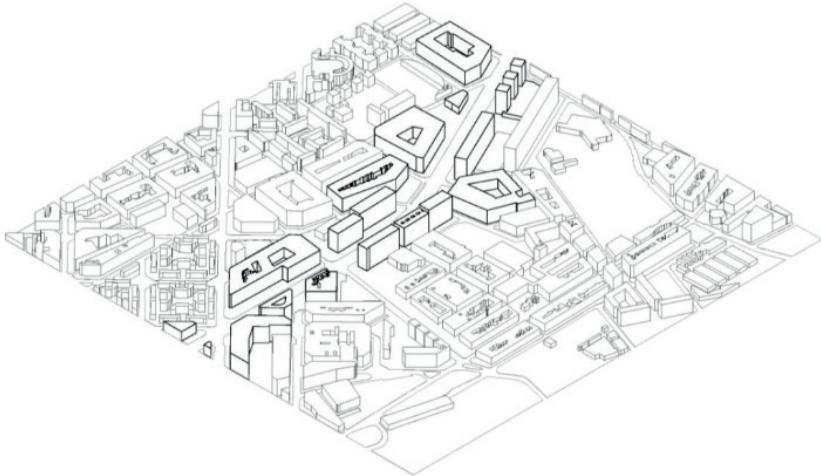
isometric site plan (Drawings by the author based on the project documents)
